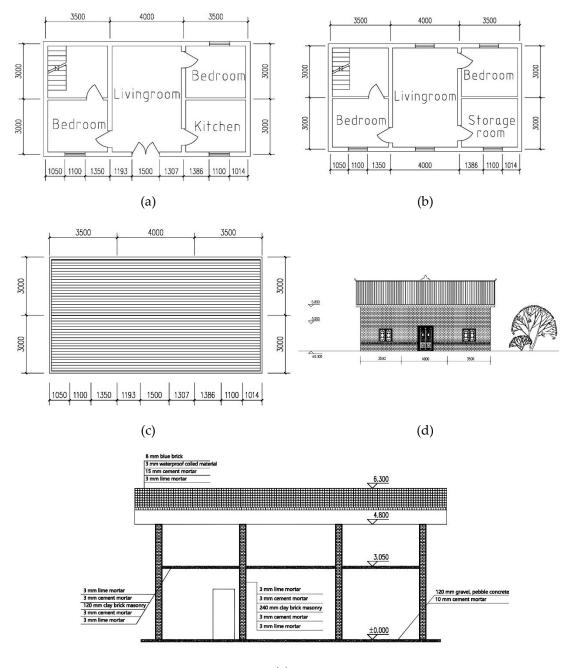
(a) First floor plan; (b) Second floor plan; (c) Roof plan; (d) Front elevation; (e) Composition of wall and floor.
